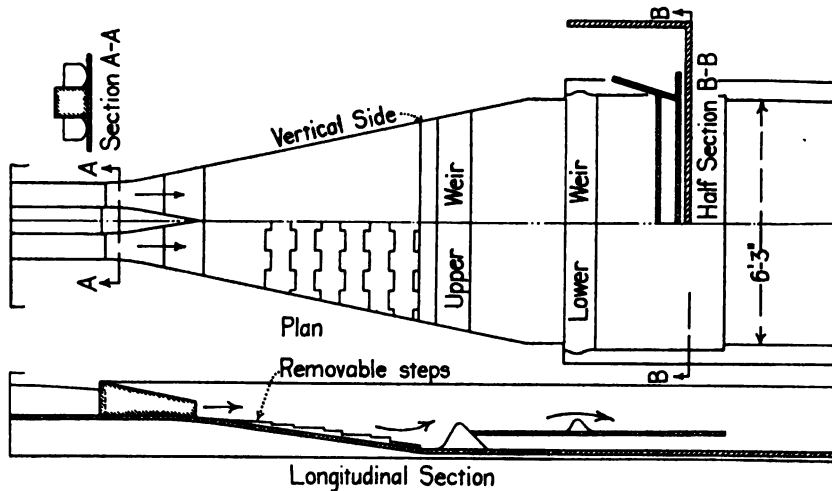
PLAN AND SECTIONS OF SECOND MODEL OF GERMAN-TOWN DAM OUTLET, SERIES F.
